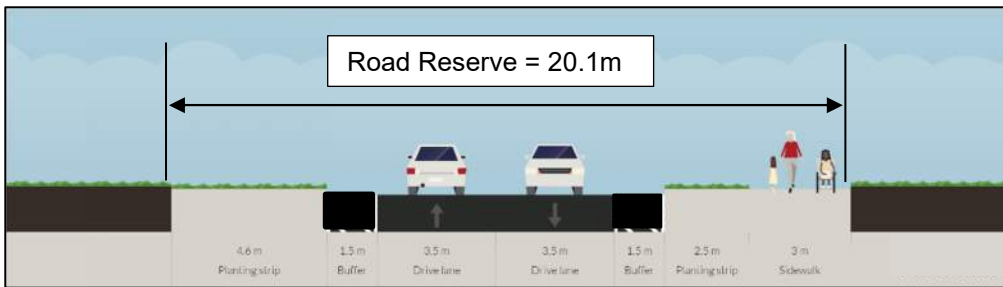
Proposed Cross Section for Lamb Street and Cambridge Road
